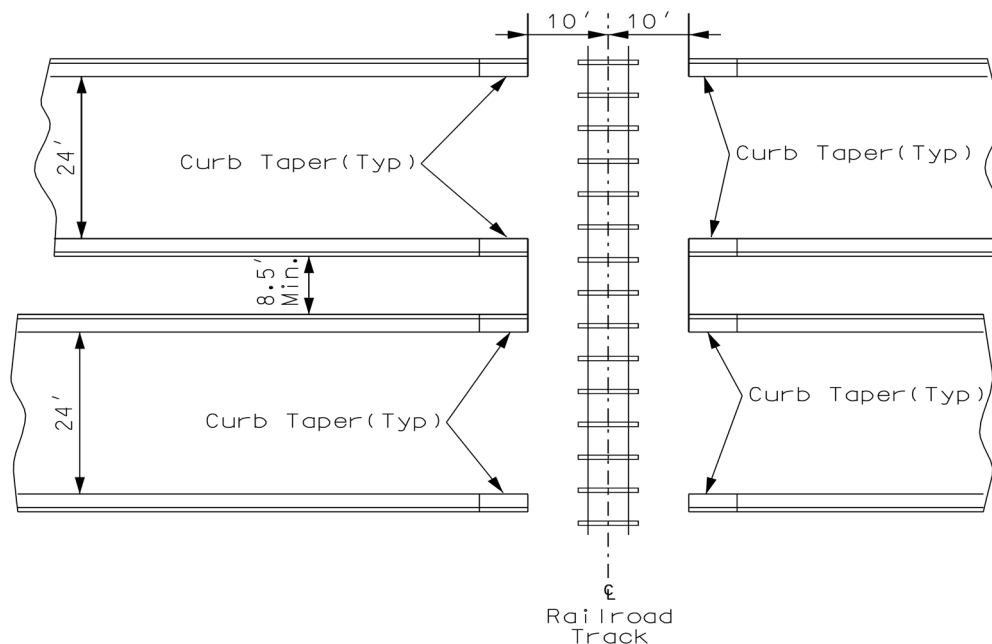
Median Layout Adjacent to Railroad Tracks
